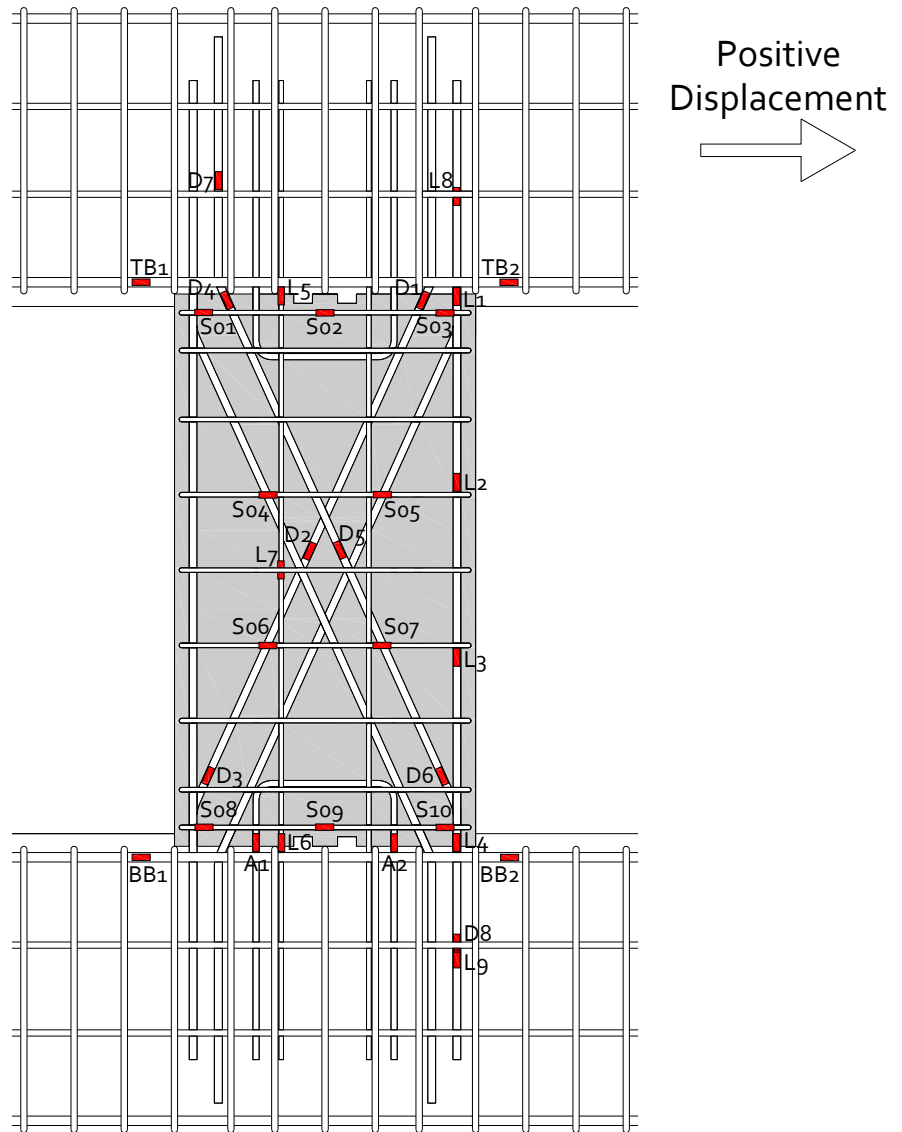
Specimen CB-1 strain gauge layout (gauges A1, L4, L8, L9 and S10 were damaged during casting)
